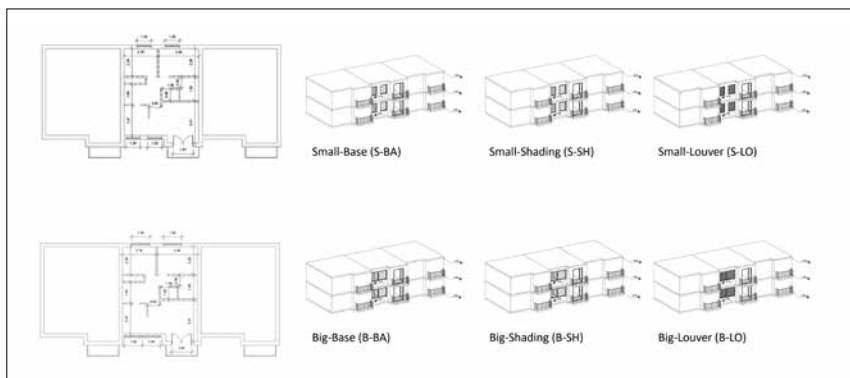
Plan and 3D model of the 2-bedroom house with the potential of cross ventilation
